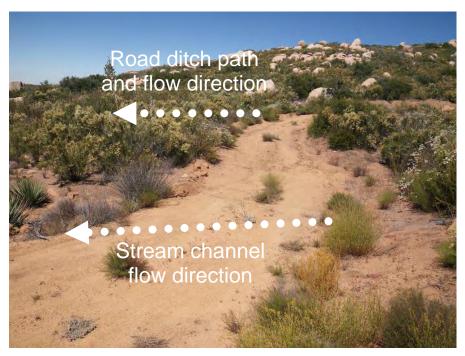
At Site 2-A looking at the lower-most road crossing of the stream channel that drains to the southwest grassland/meadow. The road ditch is also shown here.
